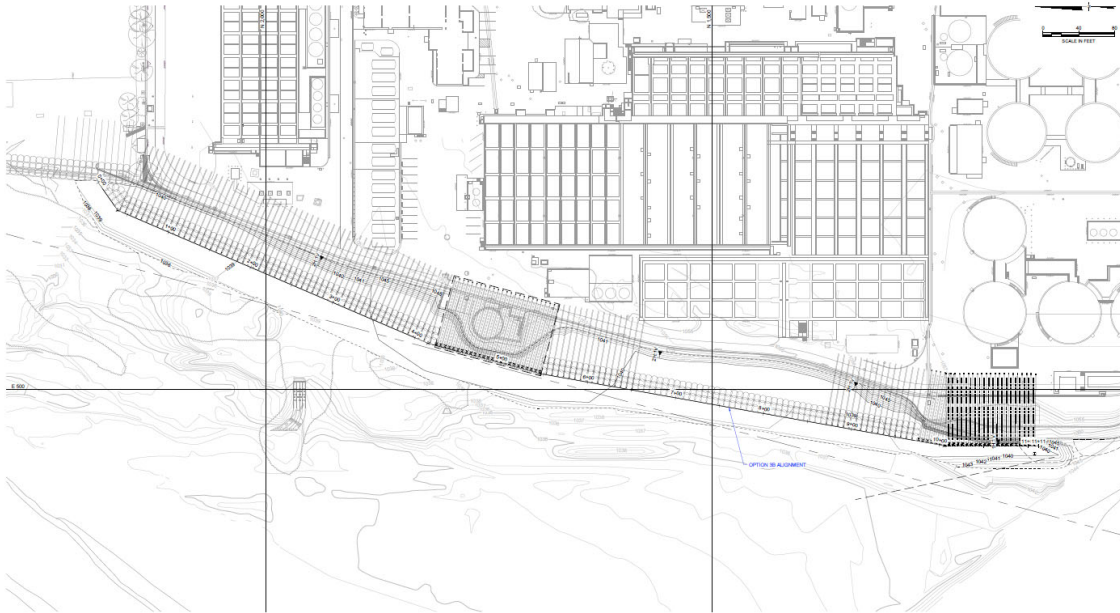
Option 3B – CDSM / Secant Pile Anchored Structure Layout
